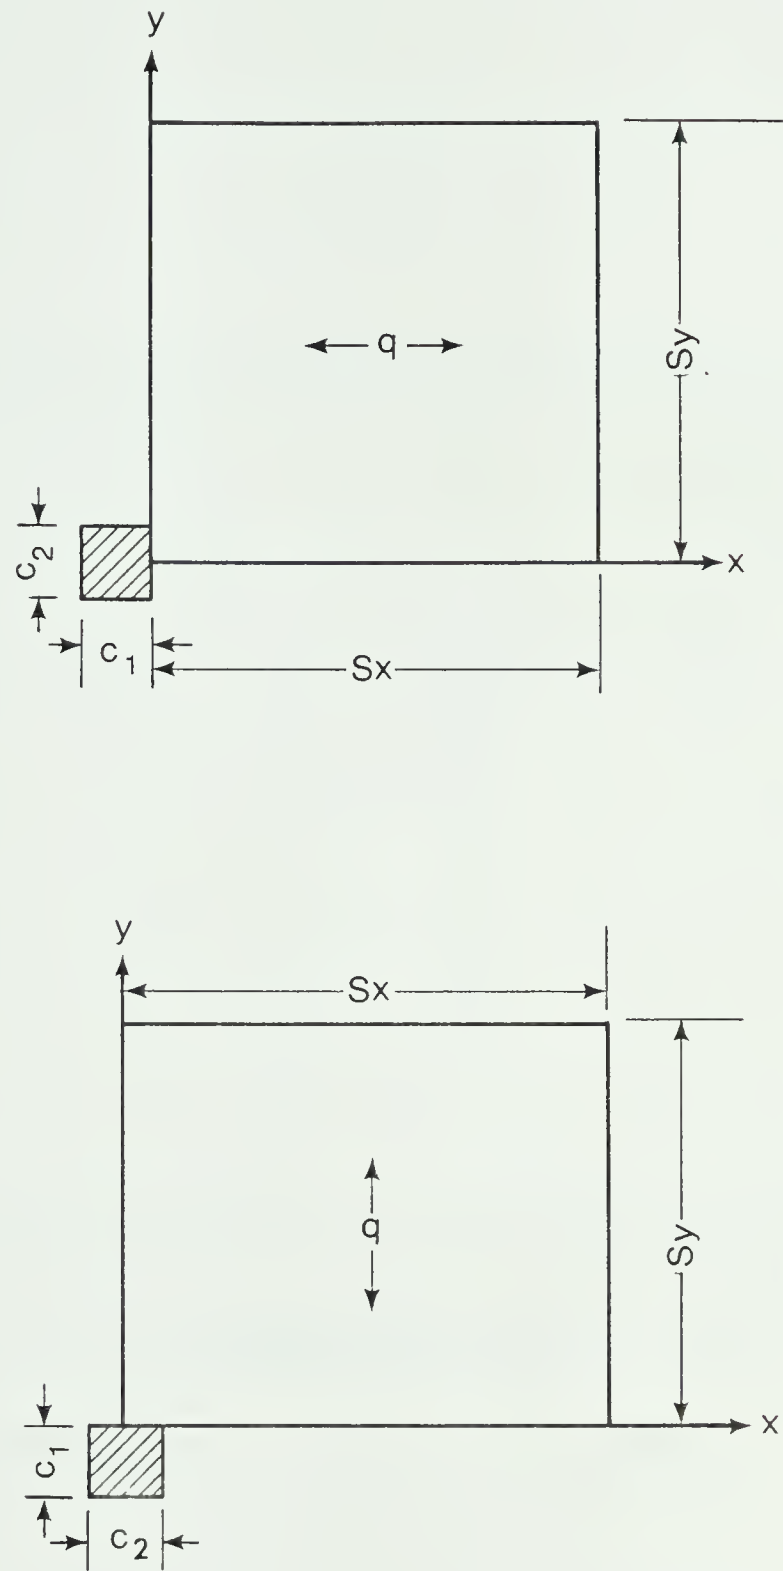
Effect of Column Size on Boundary Dimensions for a Corner Supported Segment
